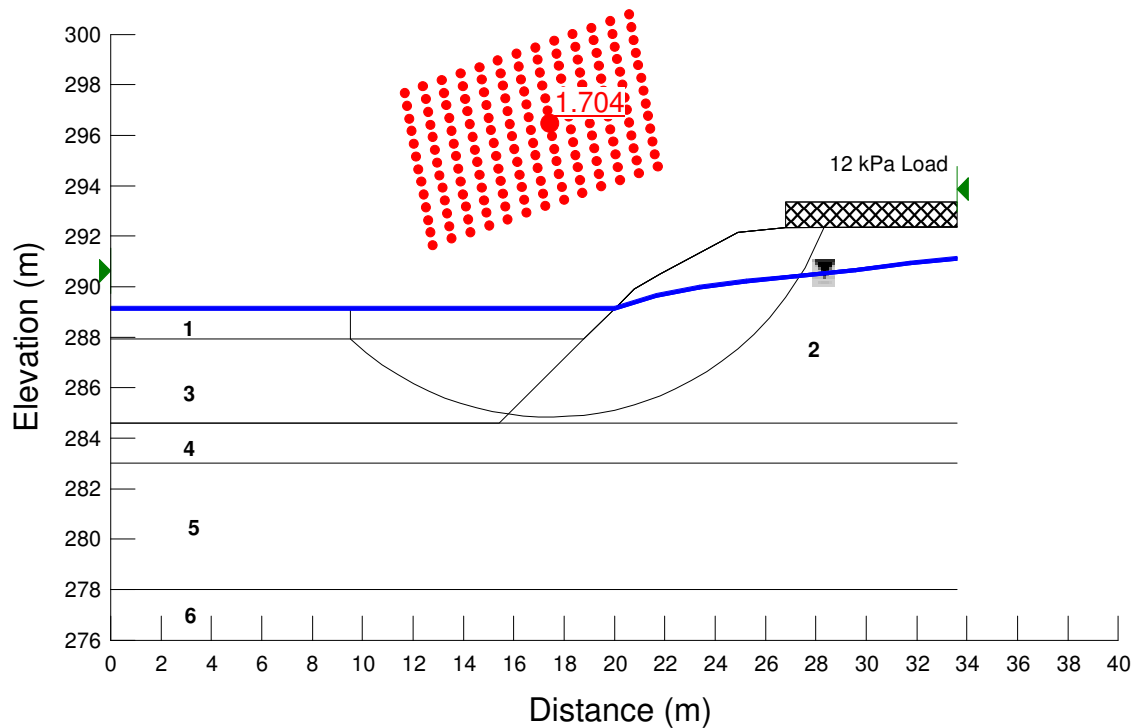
Stability of HWY11 Road Section at Sta. 14+900
